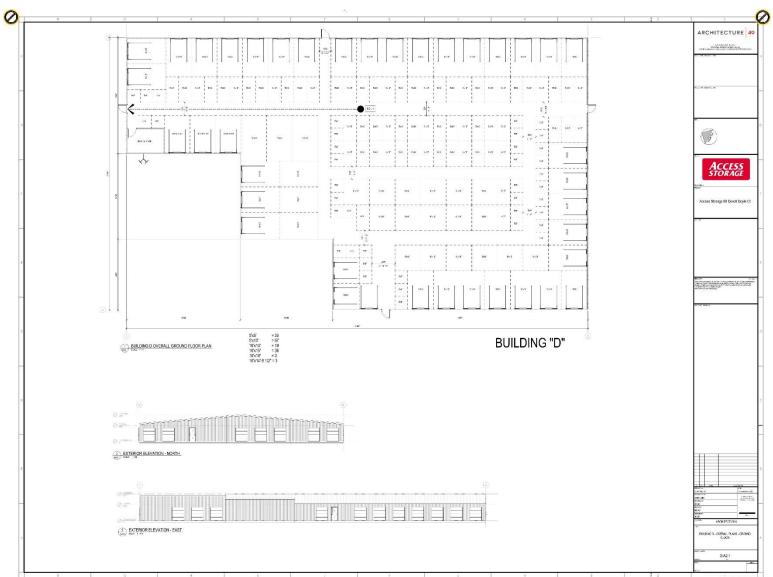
Proposed Building Elevations and Floor Plans - Building D (prepared by Architecture 49, dated November 11, 2022)
